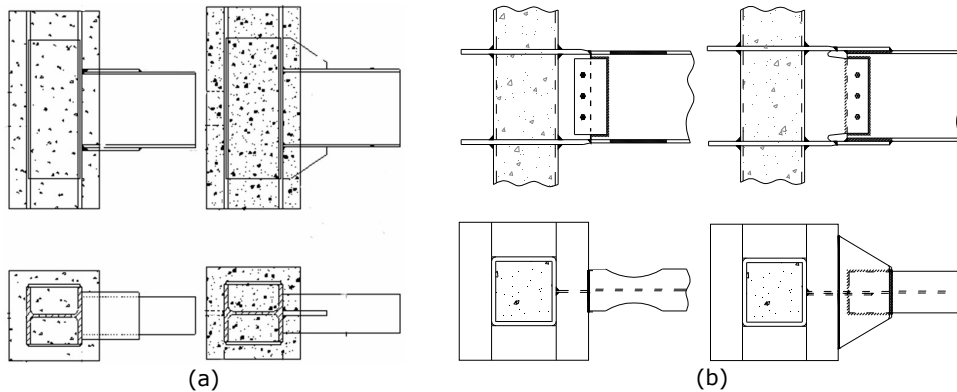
Welded beam-to-column joint configurations: (a) stiffened and cover plate joints with fully-encased wide-flange columns (Univ. Ljubljana) [4], (b) reduced beam section and cover plate joints with CFT RHS columns (Univ. Timisoara) [4]
